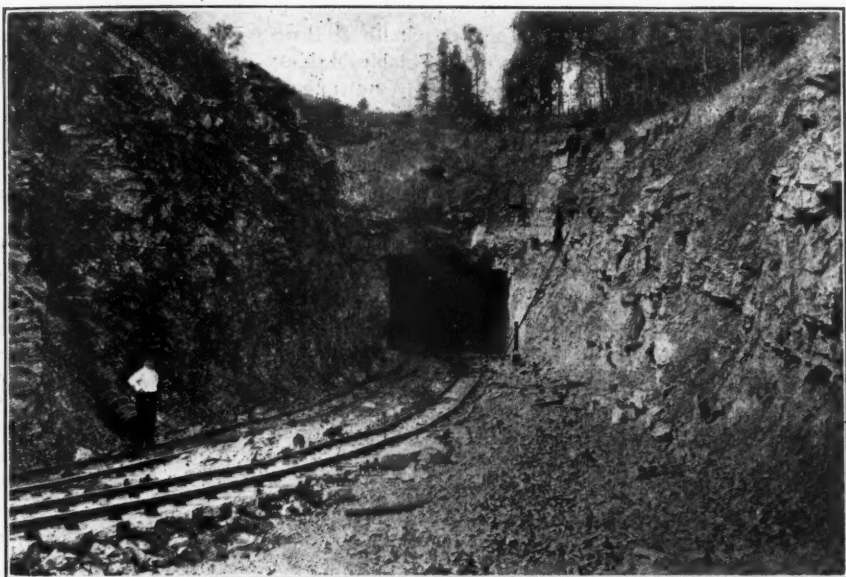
SOUTH PORTAL BLOUNT TUNNEL FULL SIZE.
